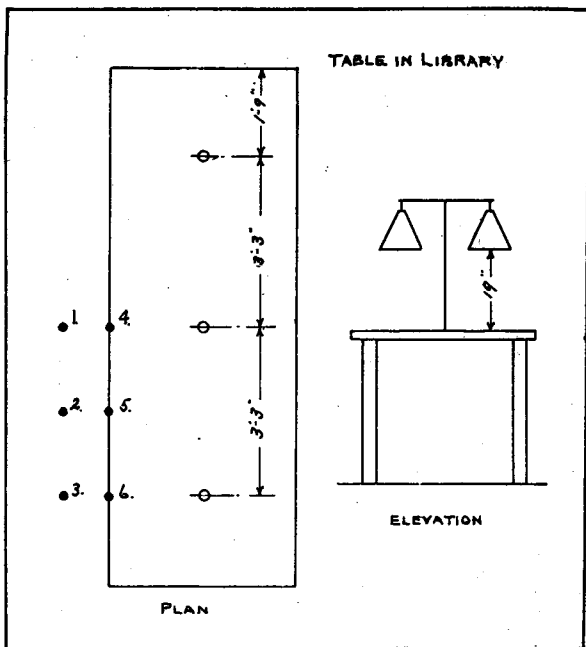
Plan and Elevation of Library Table showing Fixtures.
